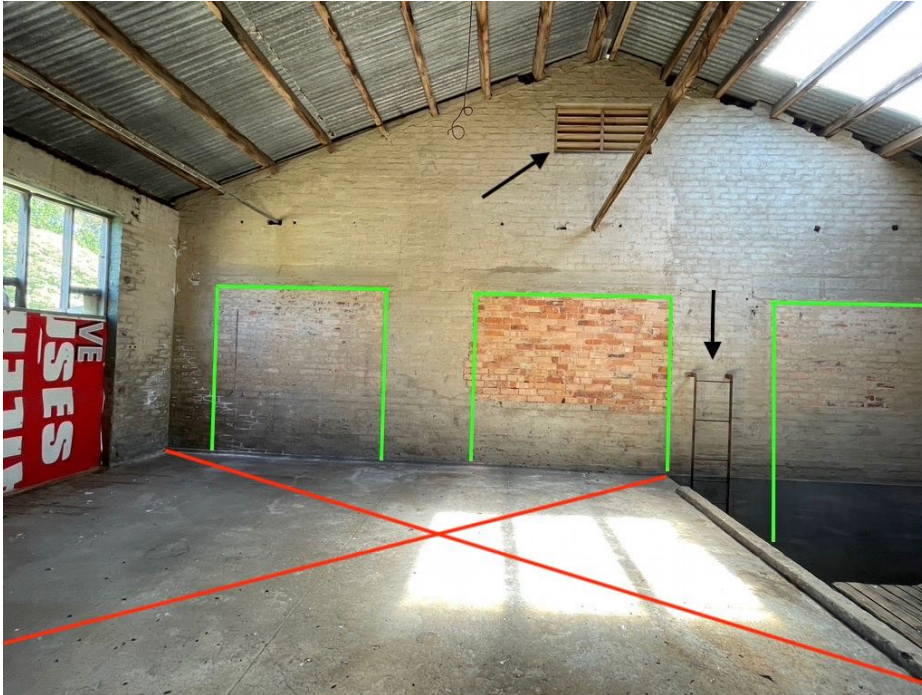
The three original window openings (bricked in later) outlined in green will be reopened and extended to floor level (the section of floor marked in red will be lowered to match the level of the lower floor at right). This will enable the staged development of the factory to be interpreted. Original features indicated by the arrows including the louvred vent and the ladder will be retained.
